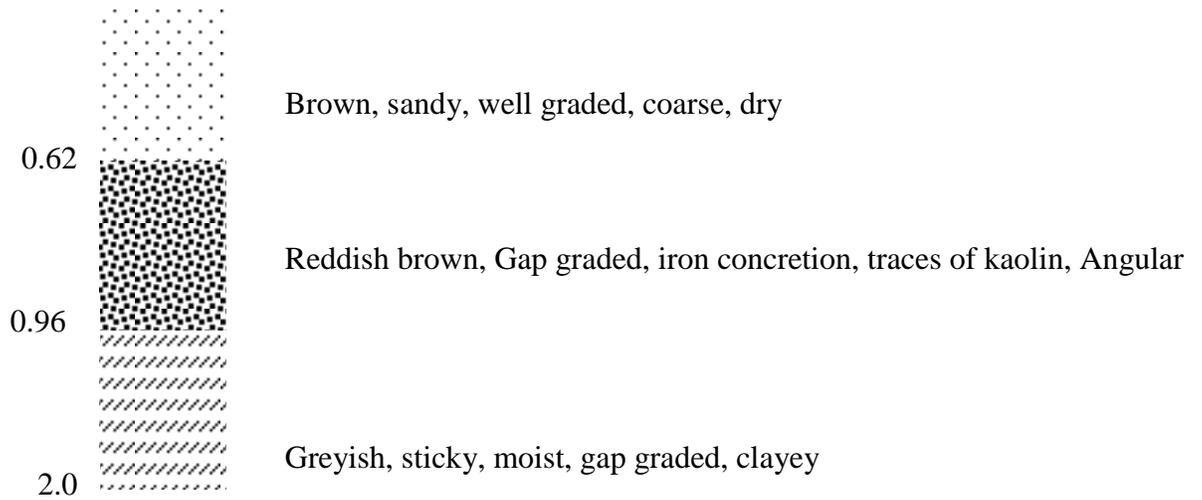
Typical Soil Profile at location Aduka and Gambri along the Road
